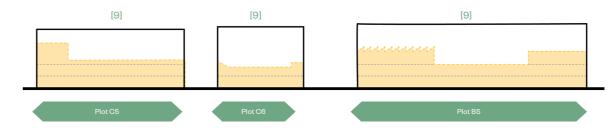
Illustrative elevation BB - Enterprise Yard looking west
